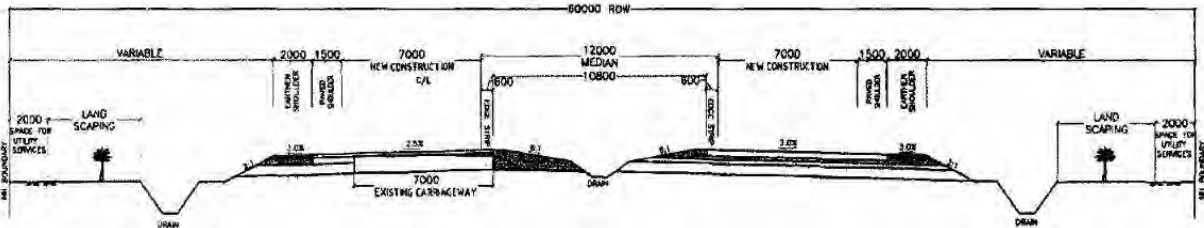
Typical Cross Section for right side widening without service road (TCS-4)
